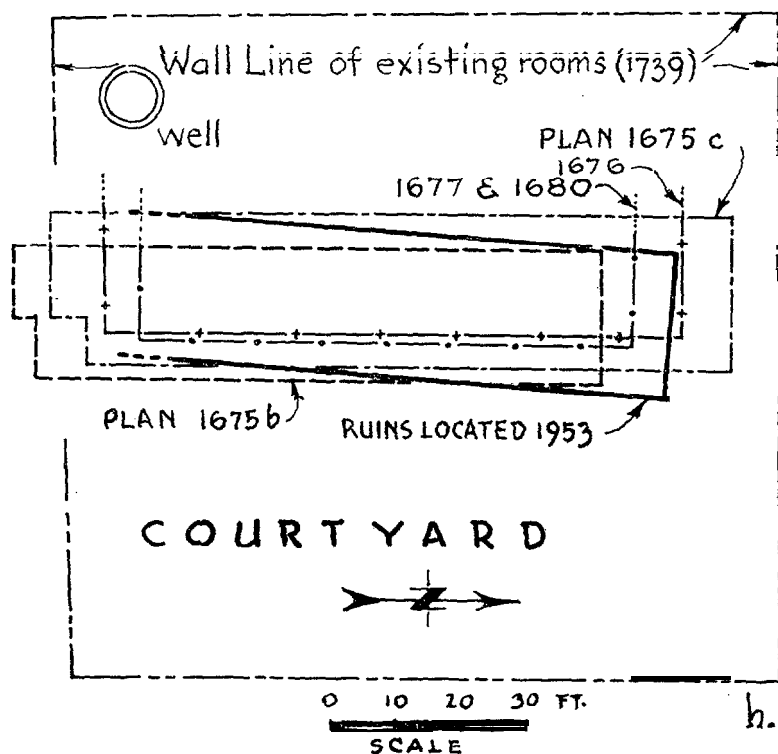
Schematic plans of the courtyard structure of 1675 as indicated on four contemporary plans, to show relation to foundations excavated in 1953.
